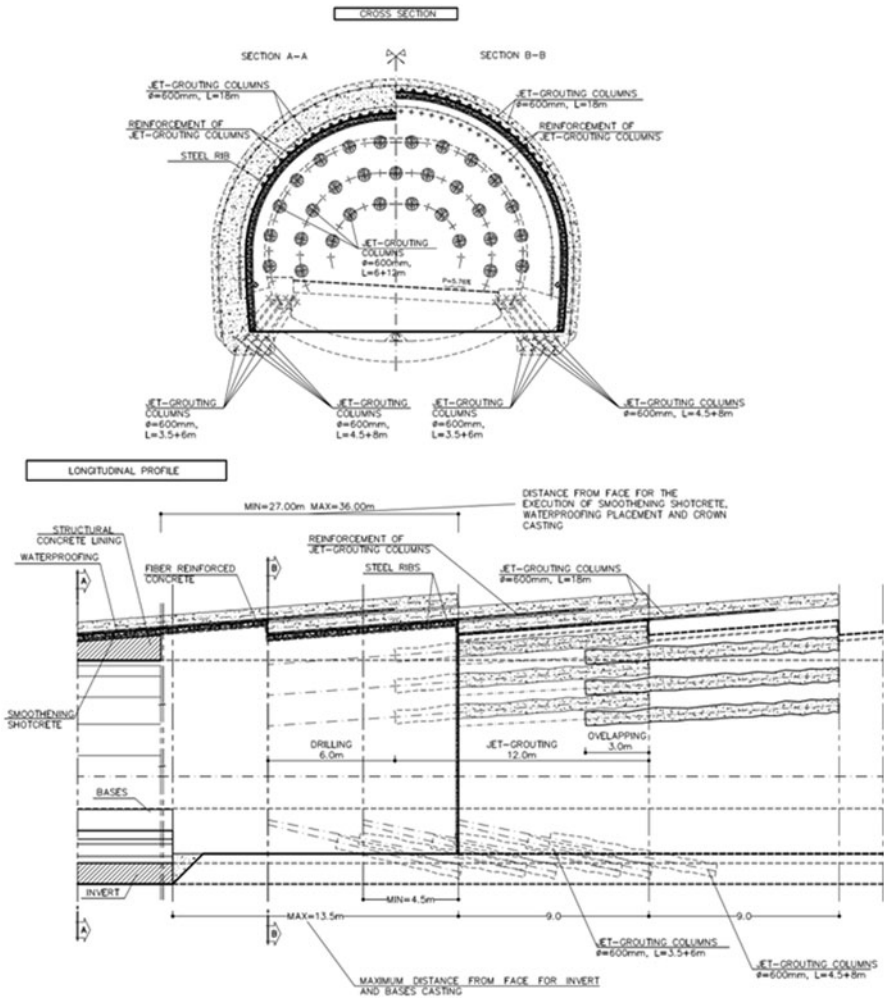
Jet-grouting vaults reinforced underneath, with total overlapping: cross-sectional and longitudinal profile. In this case, the consolidation of the core with jet-grouting columns was foreseen as well
